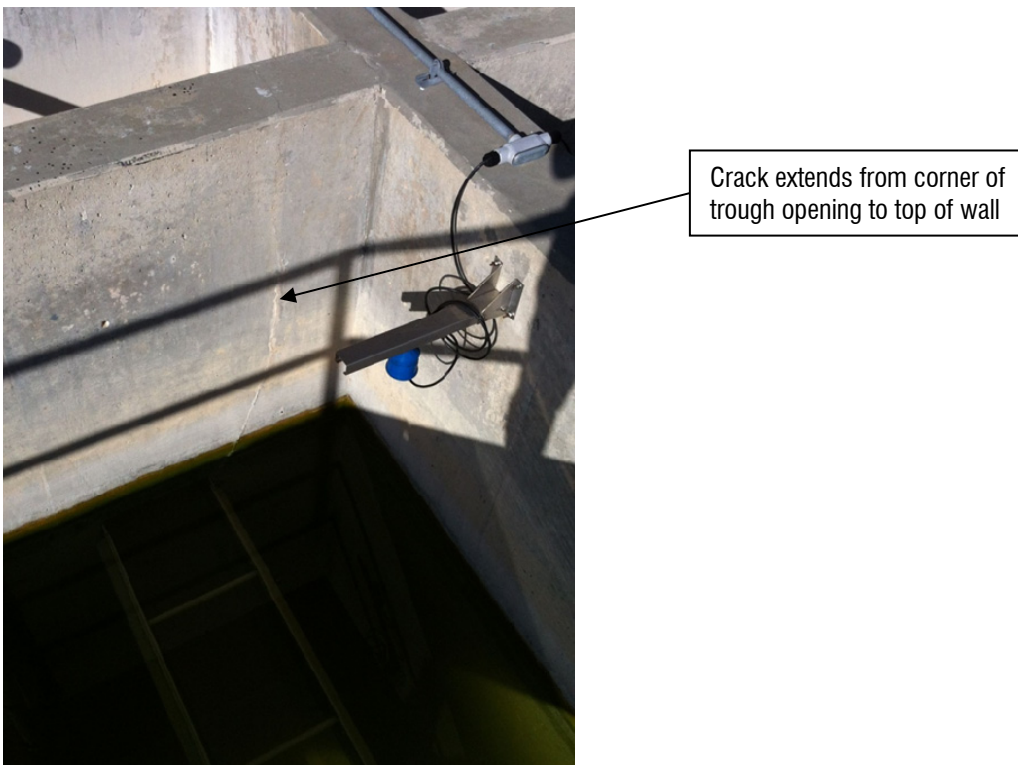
Exterior West wall of Filters No. 1,3,5, and 7
